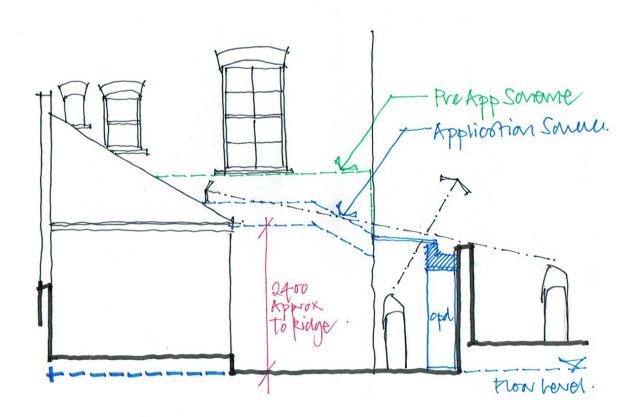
Sketch section showing alterations to roof form and positioning of roof light to generate internal height without exceeding the height of the boundary wall.
